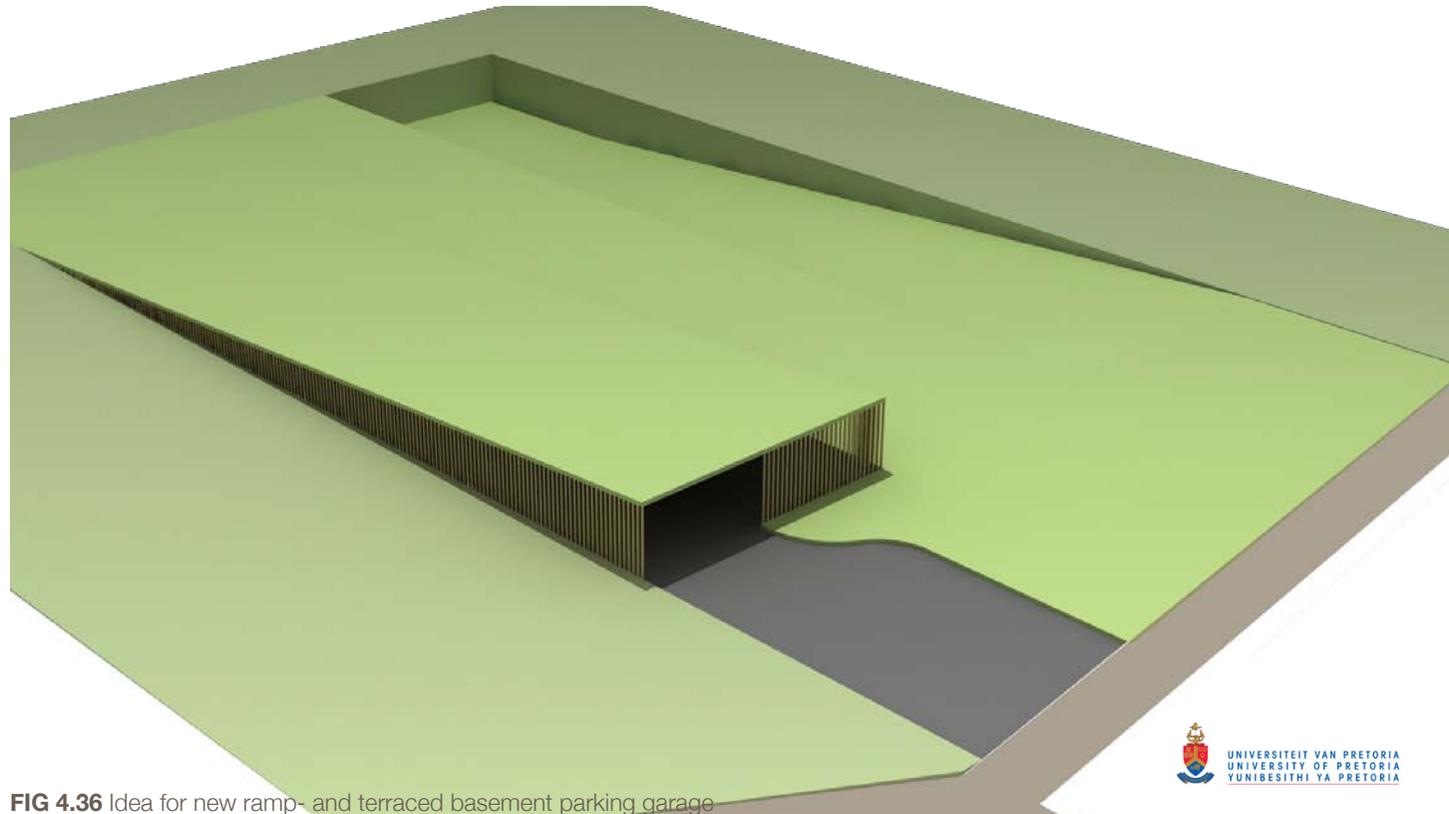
Idea for new ramp- and terraced basement parking garage
